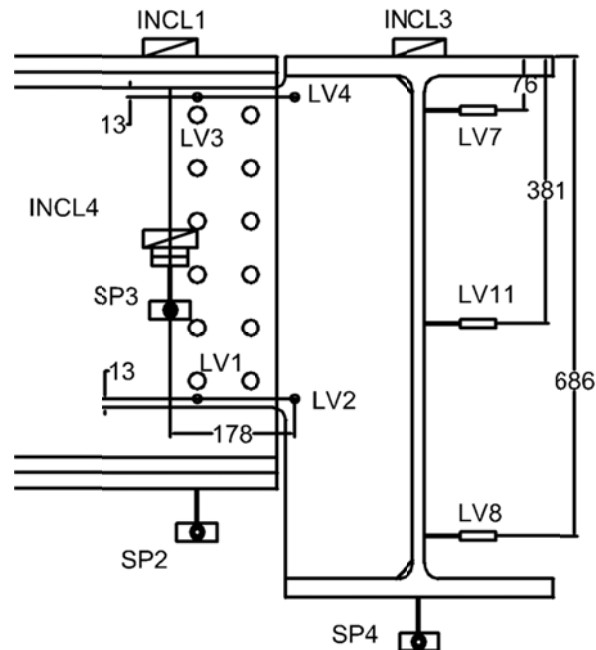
Out of Plane LVDT Layout, Configuration 11
